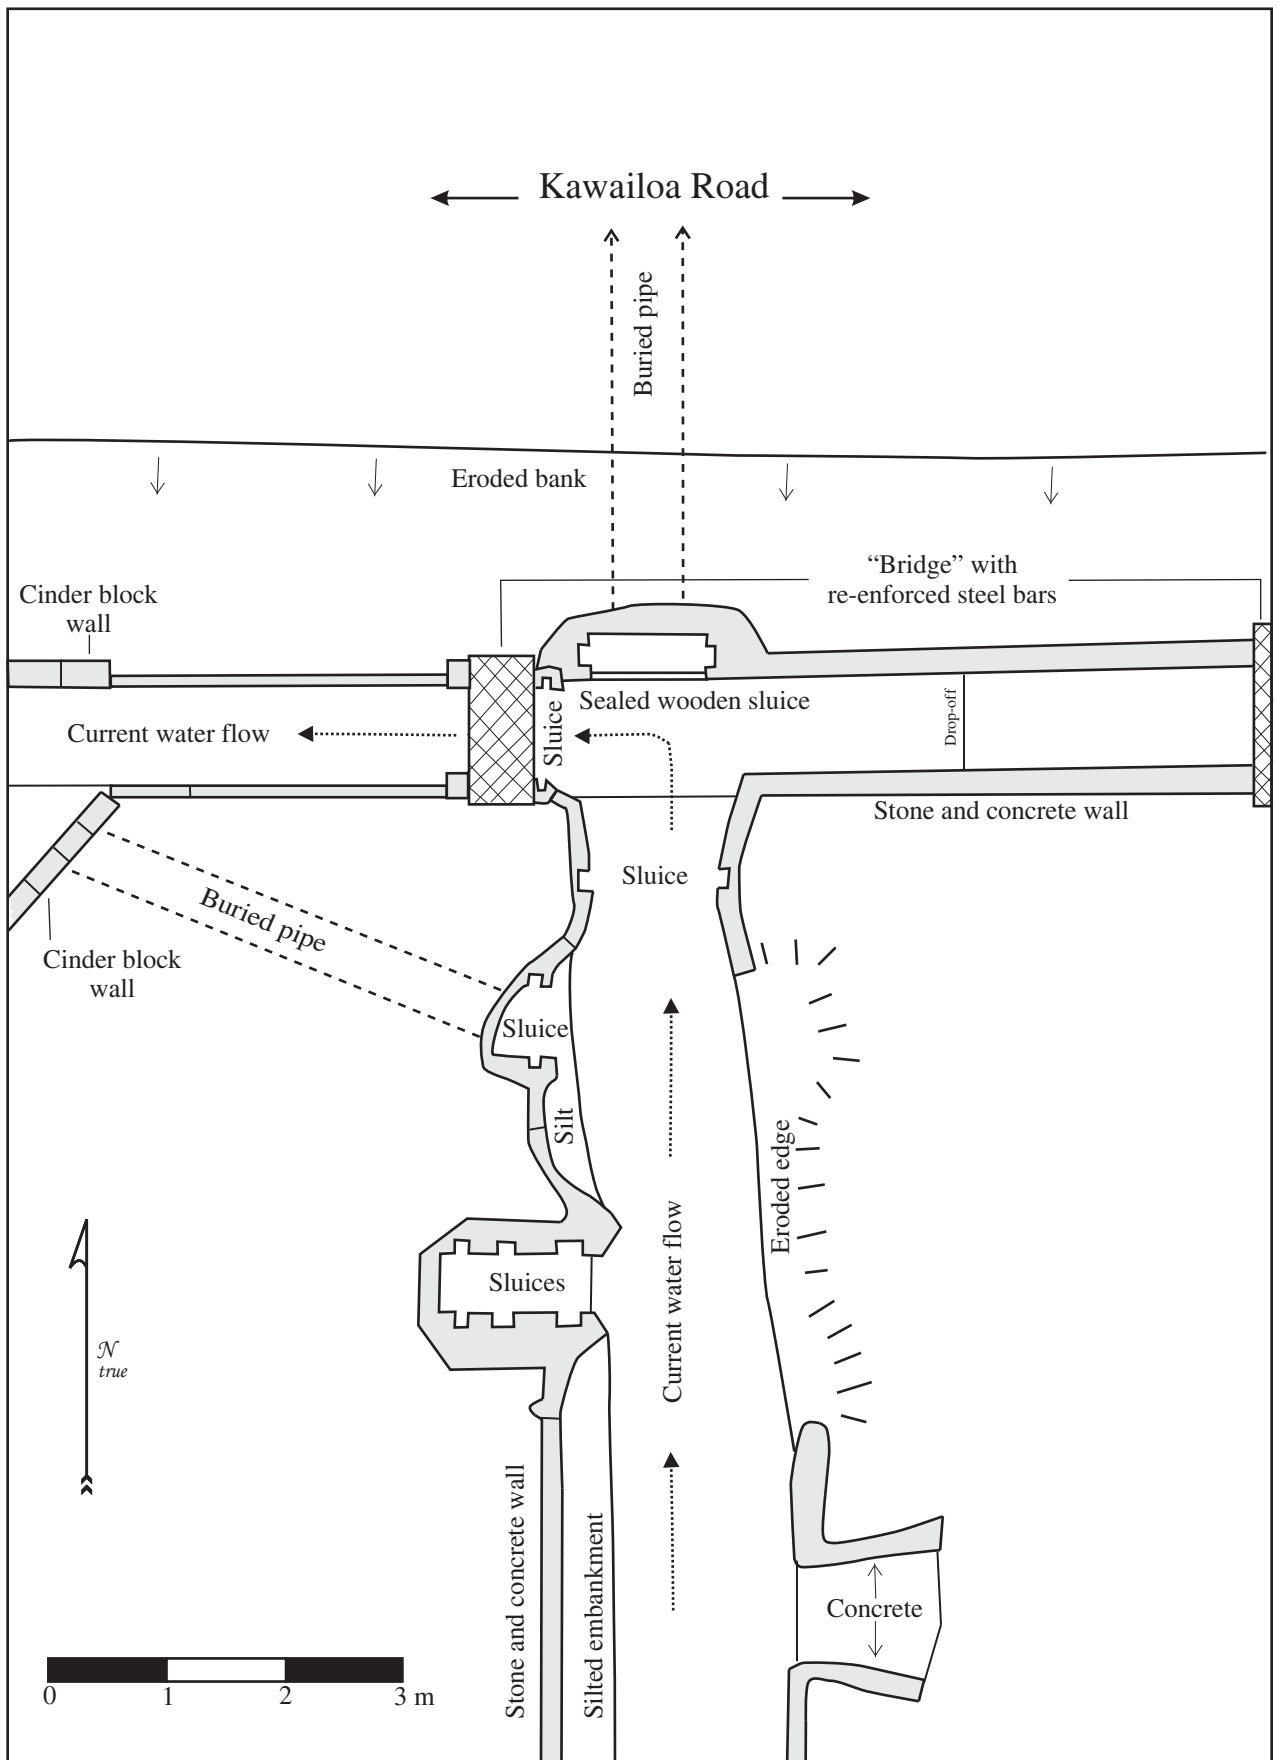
Site 7159 Section 4 sluice gate complex plan view.
